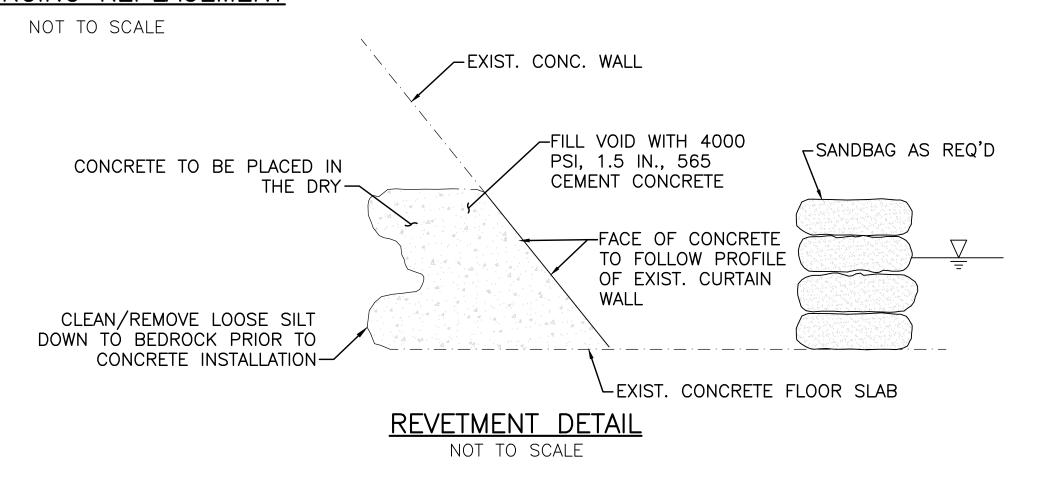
SHALLOW DEPTH SUBSTRUCTURE REPAIR
